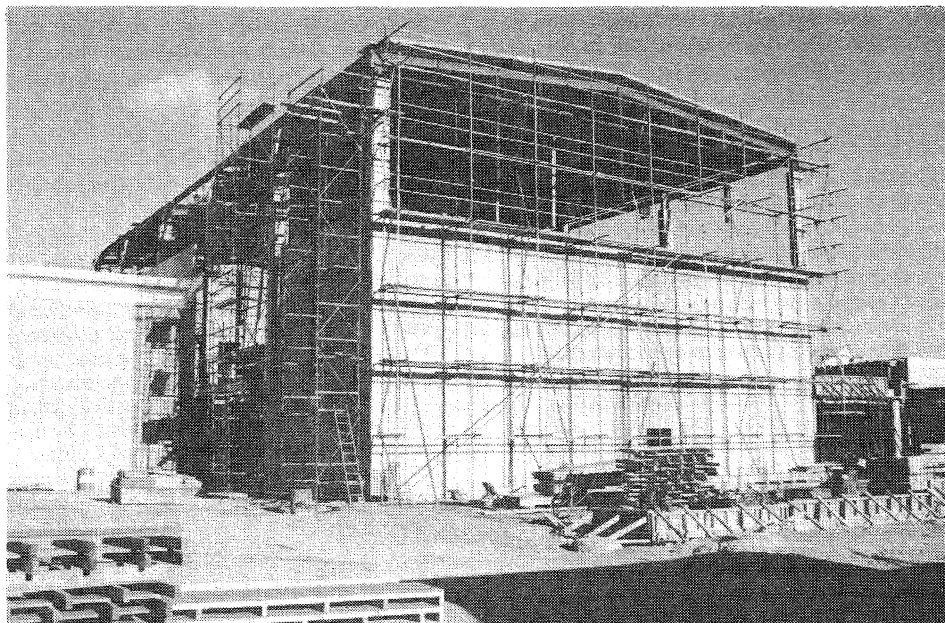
BUILDING FOR WELLINGTON NEWSPAPERS LTD UNDER CONSTRUCTION, 1990.
